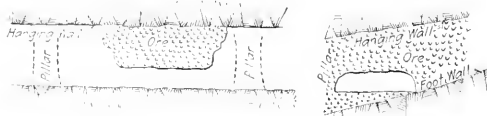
LONGITUDINAL AND CROSS-SECTIONS OF STOPE
